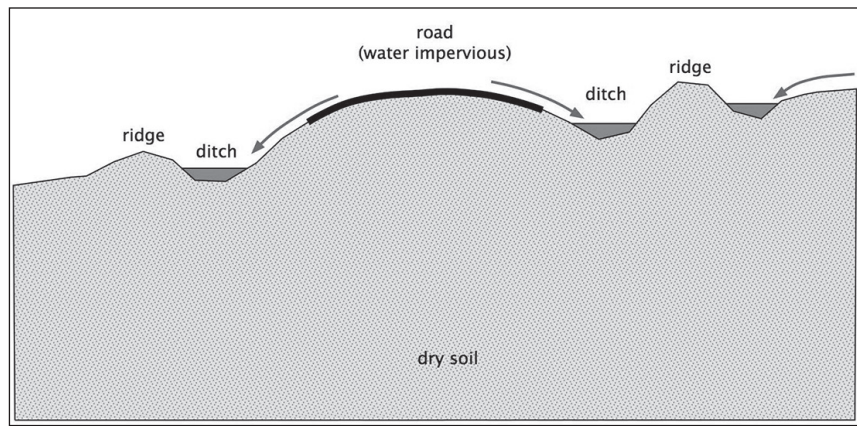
Section diagram of a paved desert road on a fan. Water can collect in three places: in the two ditches from runoff from the impervious pavement, and from surface flow down the fan where it ponds up adjacent to and immediately uphill of the uphill ridge.
